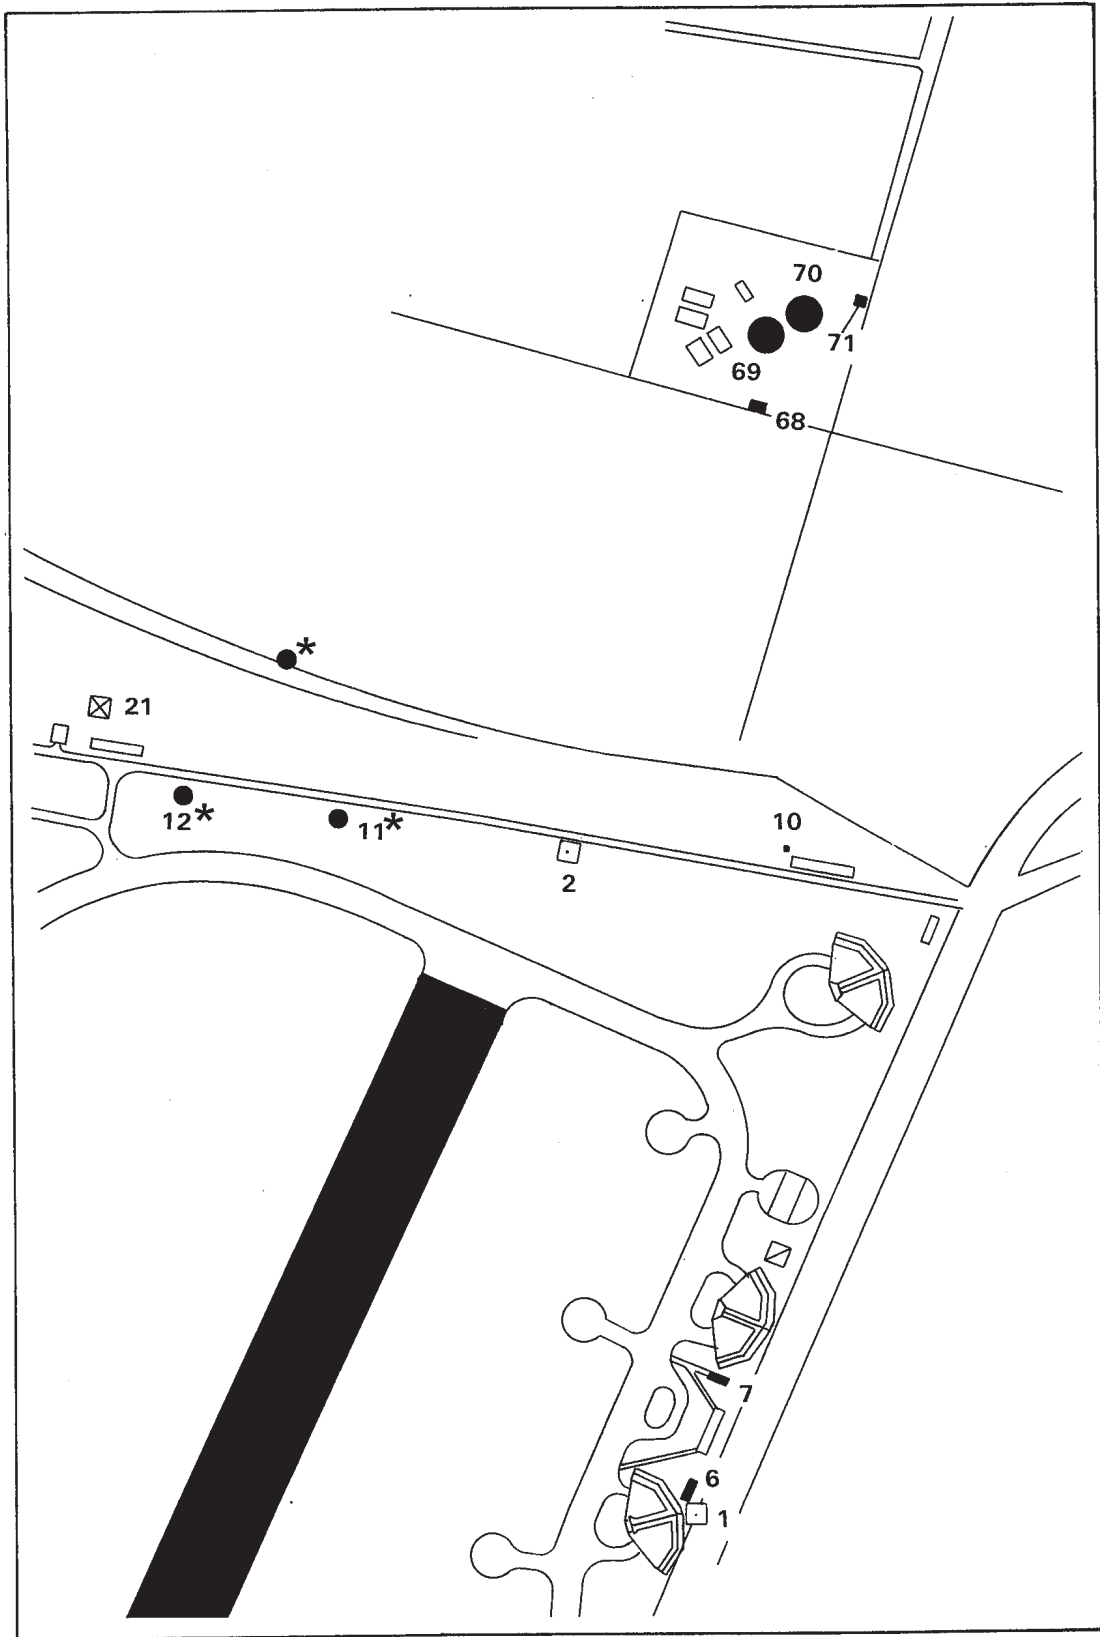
Plan showing surviving buildings (February 1997) on the north-east of the airfield and sewage disposal site. * indicates Scheduled structure.
